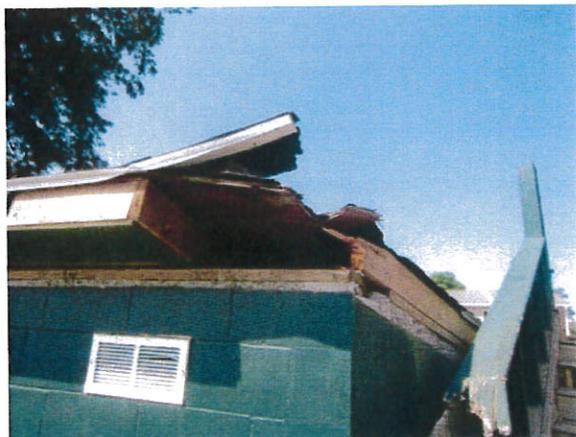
Damaged Roof at Northeast Corner of Storage Building
